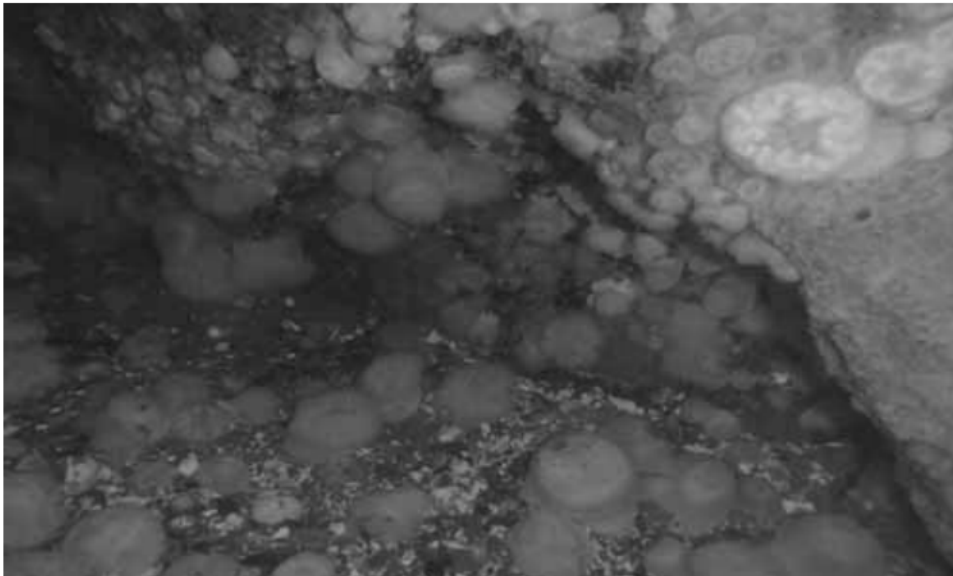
Canal Bridge No. 6880 - spall in the concrete collar on Pile No. 7.1 on Pier No. 8.
